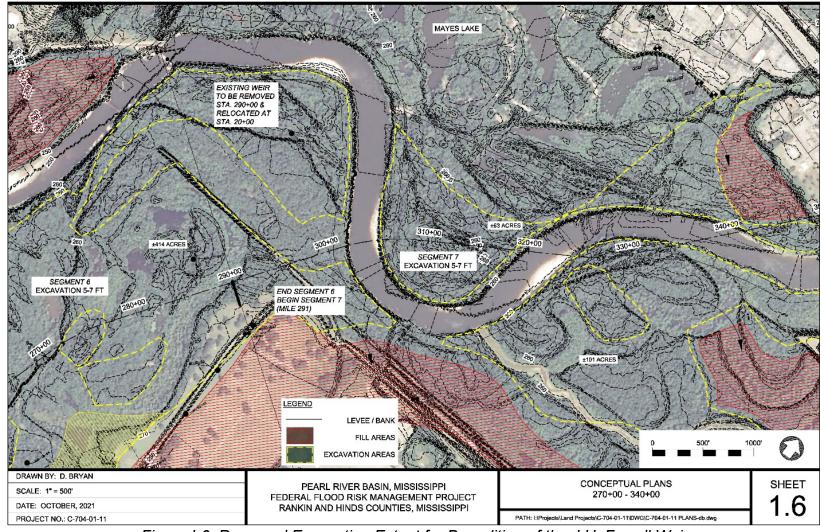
Proposed Excavation Extent for Demolition of the J.H. Fewell Weir
